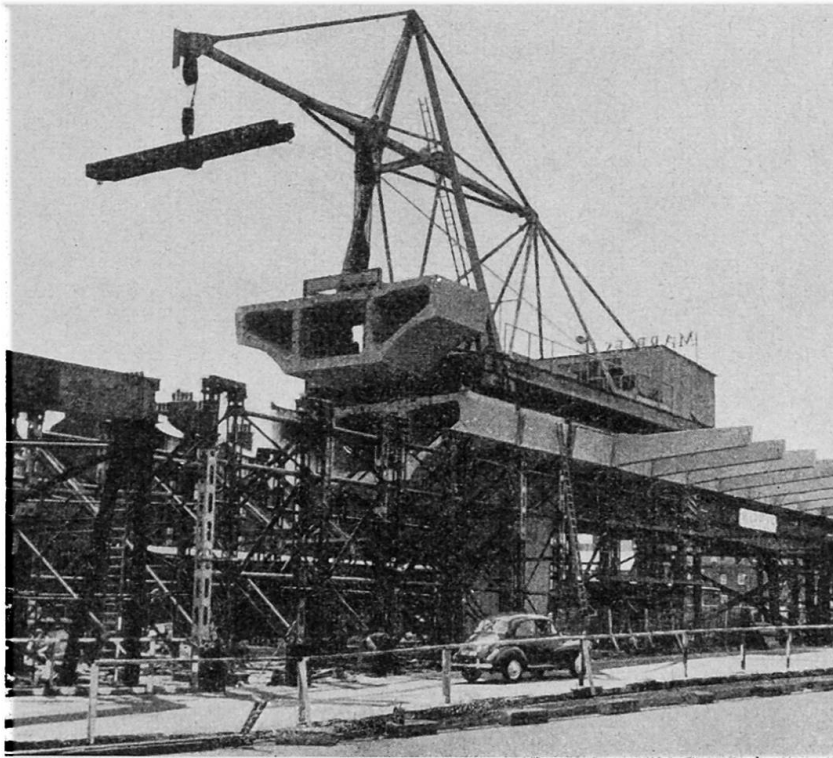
Precast concrete units for Hammersmith Flyover.
